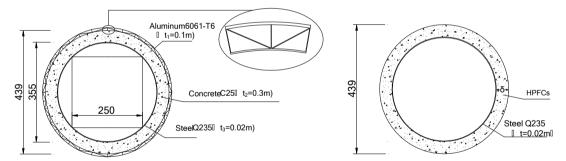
Sandwich cross-section Figure 4. Tubes section designed with different HPFCs
